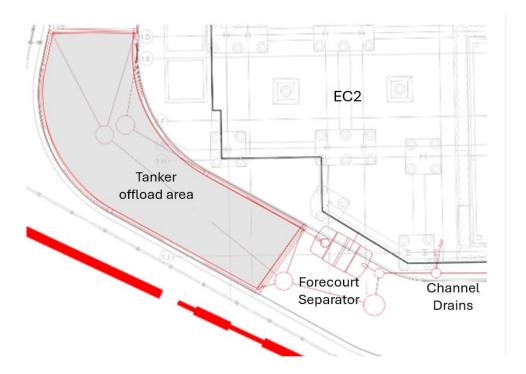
Drainage systems in refuelling area southwest of EC2
